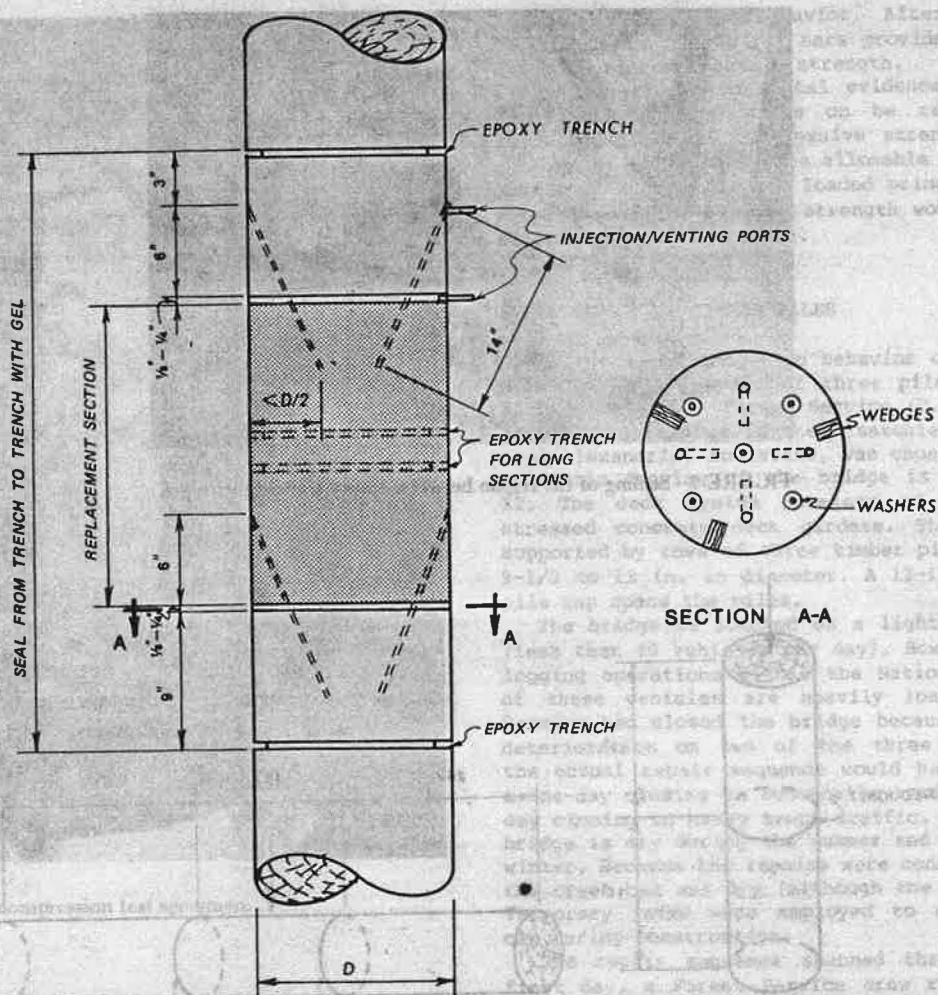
Schematic layout for epoxy repair of timber piles.
